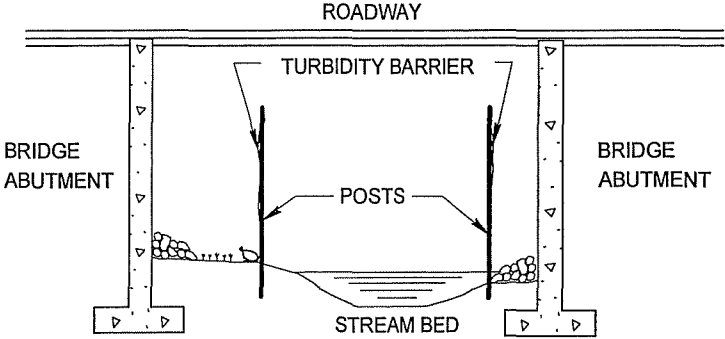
TURBIDITY BARRIER DETAIL SHOWING TYPICAL PLACEMENT AT STRUCTURES
